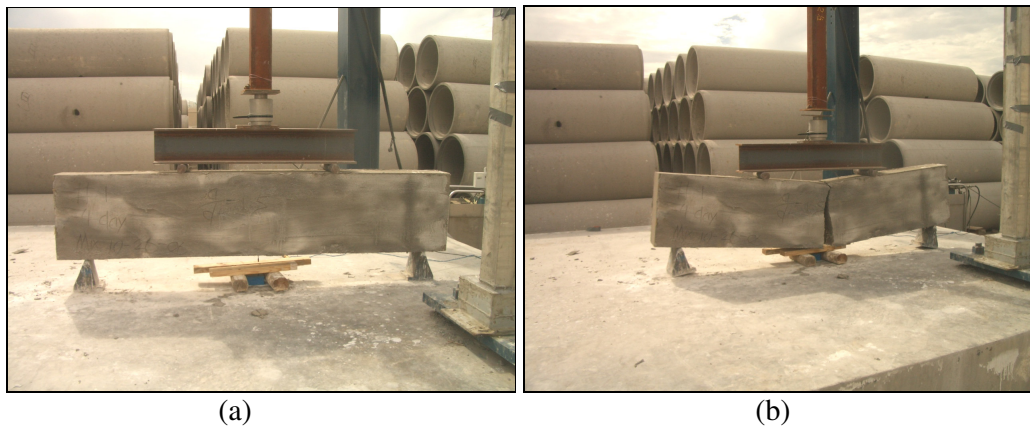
Beam for 1<sup>st</sup> batch concrete cast on 10/26/06 for 3 day test;
